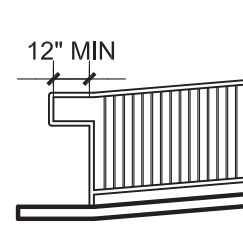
TOP HANDRAIL EXTENSIONS AT STAIRS
